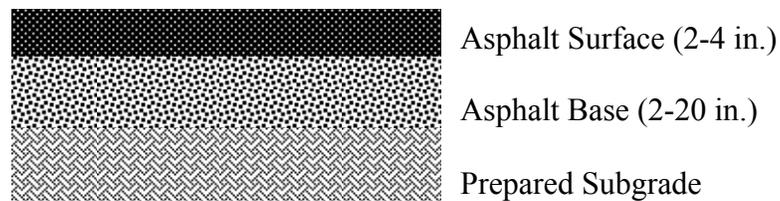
Typical Cross Section of a Full-Depth Asphalt Pavement
